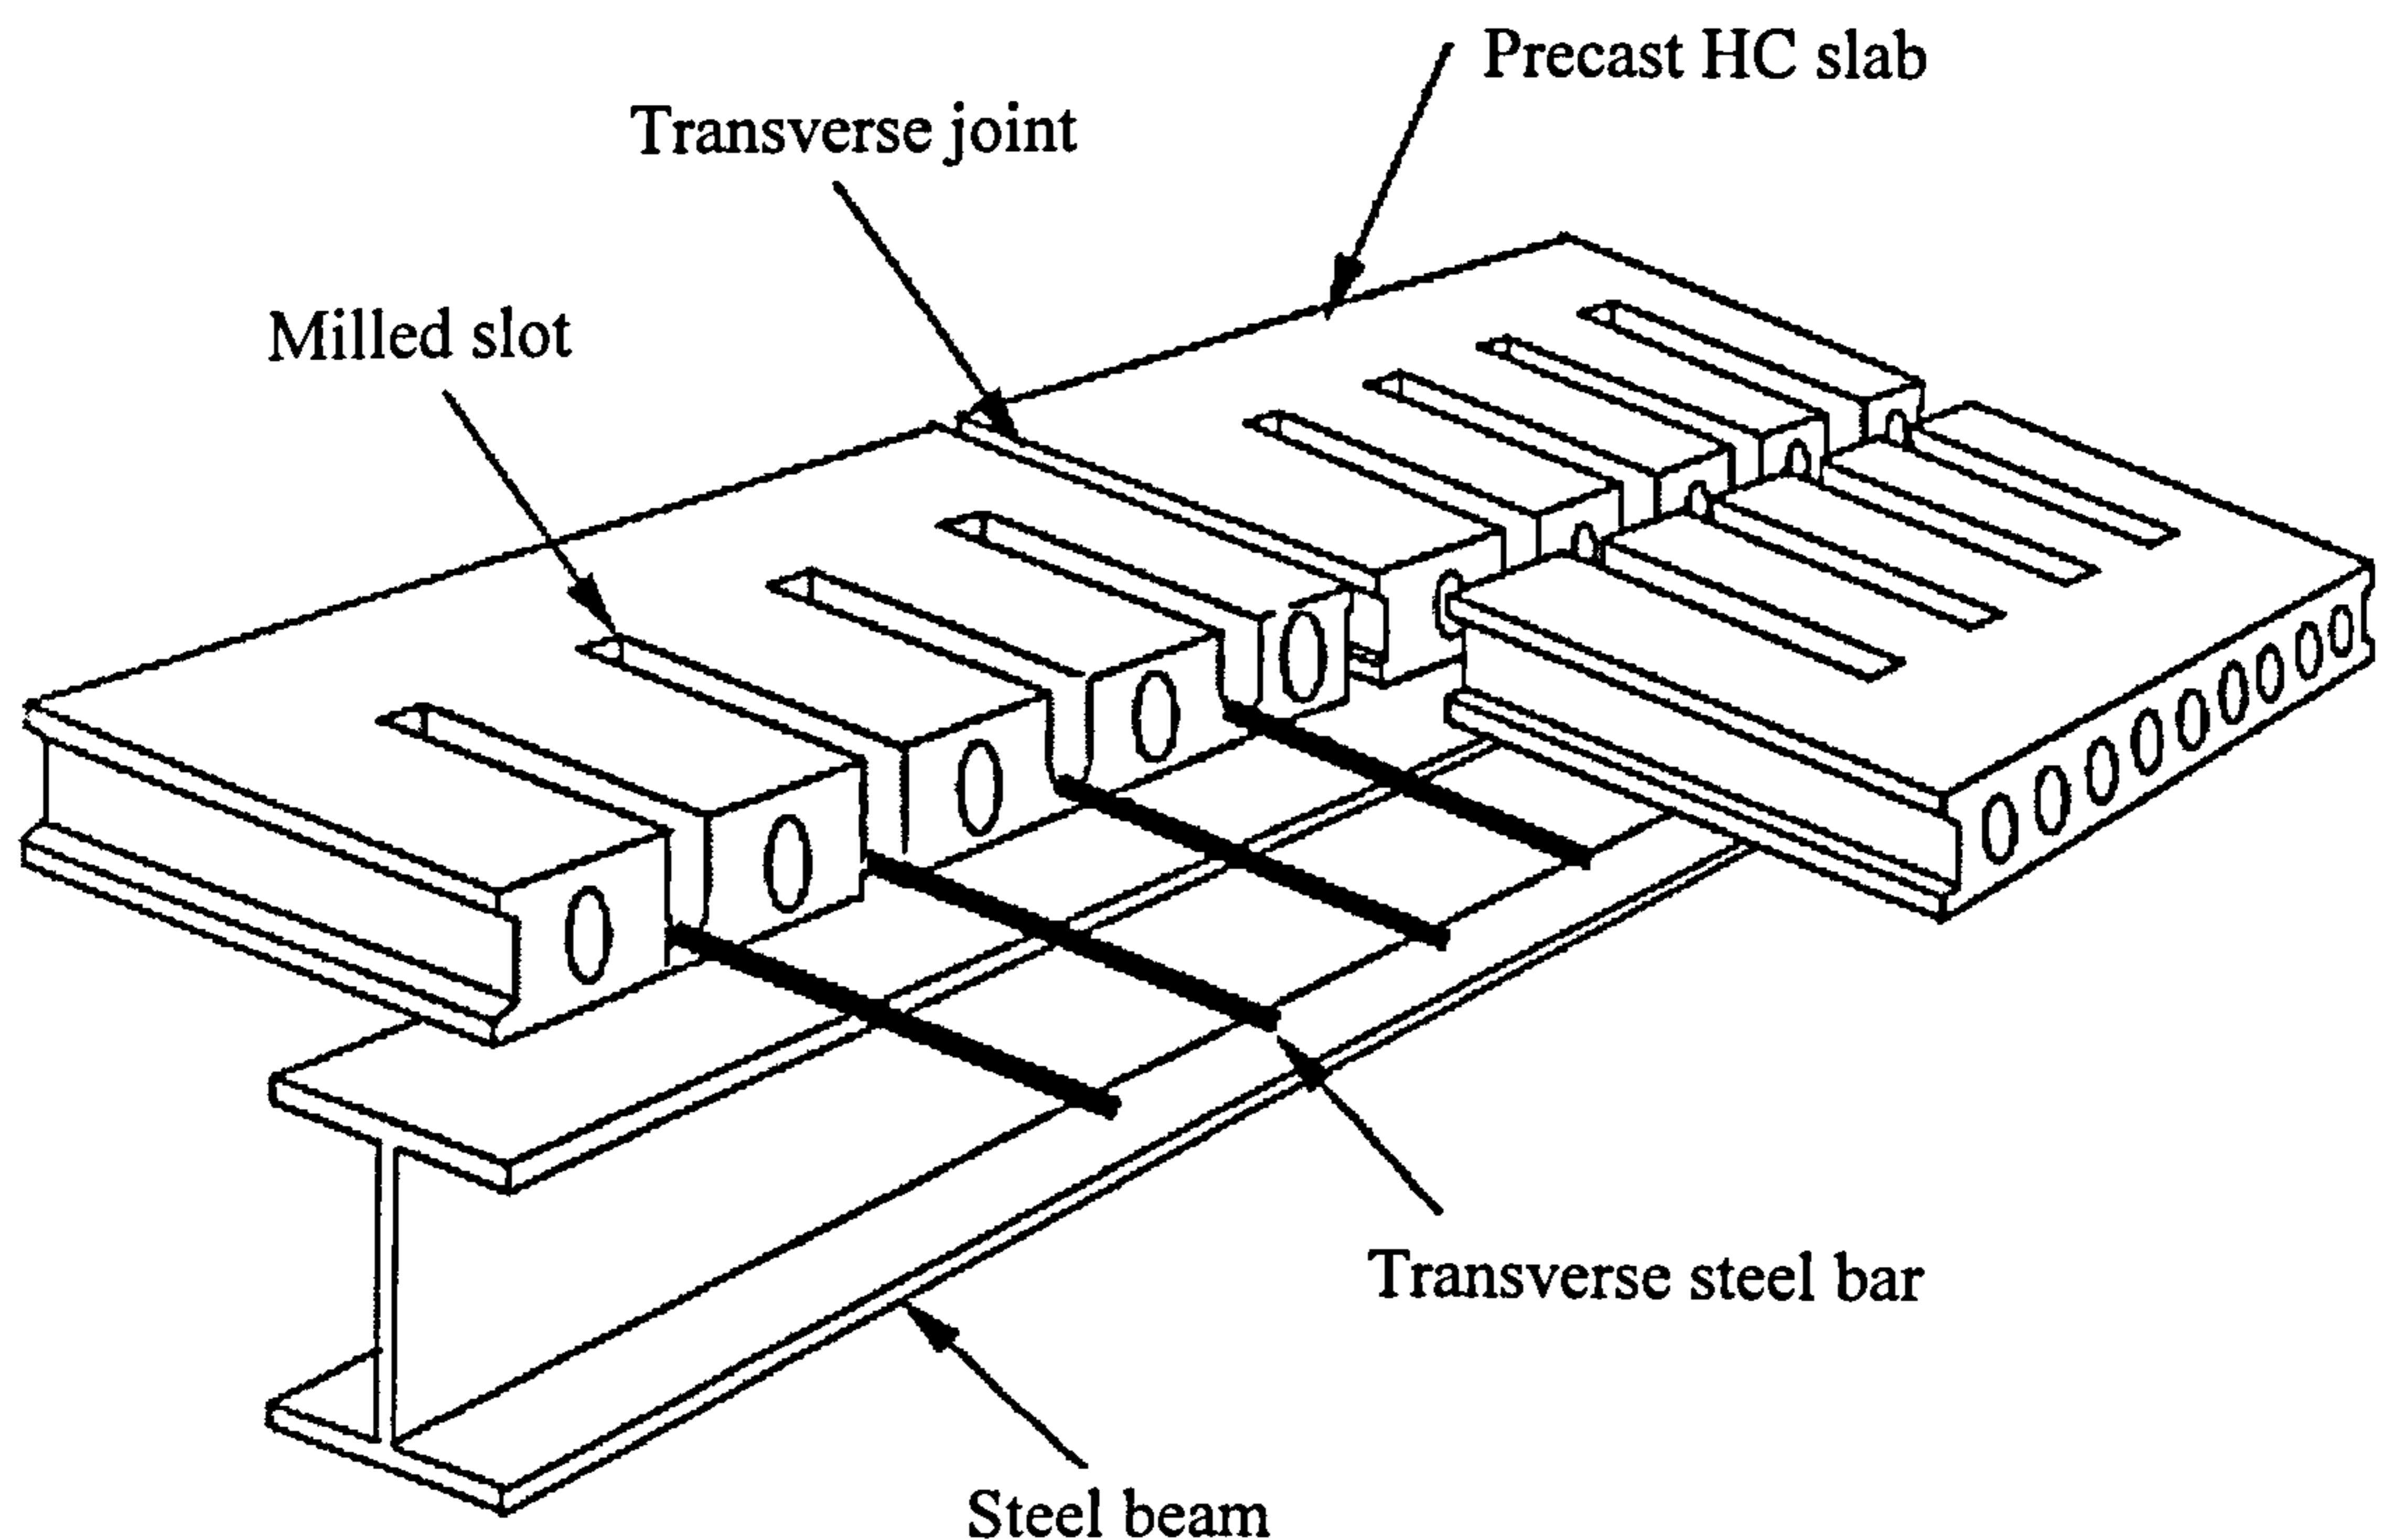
Precast HCU's rest on steel beam with no composite action
